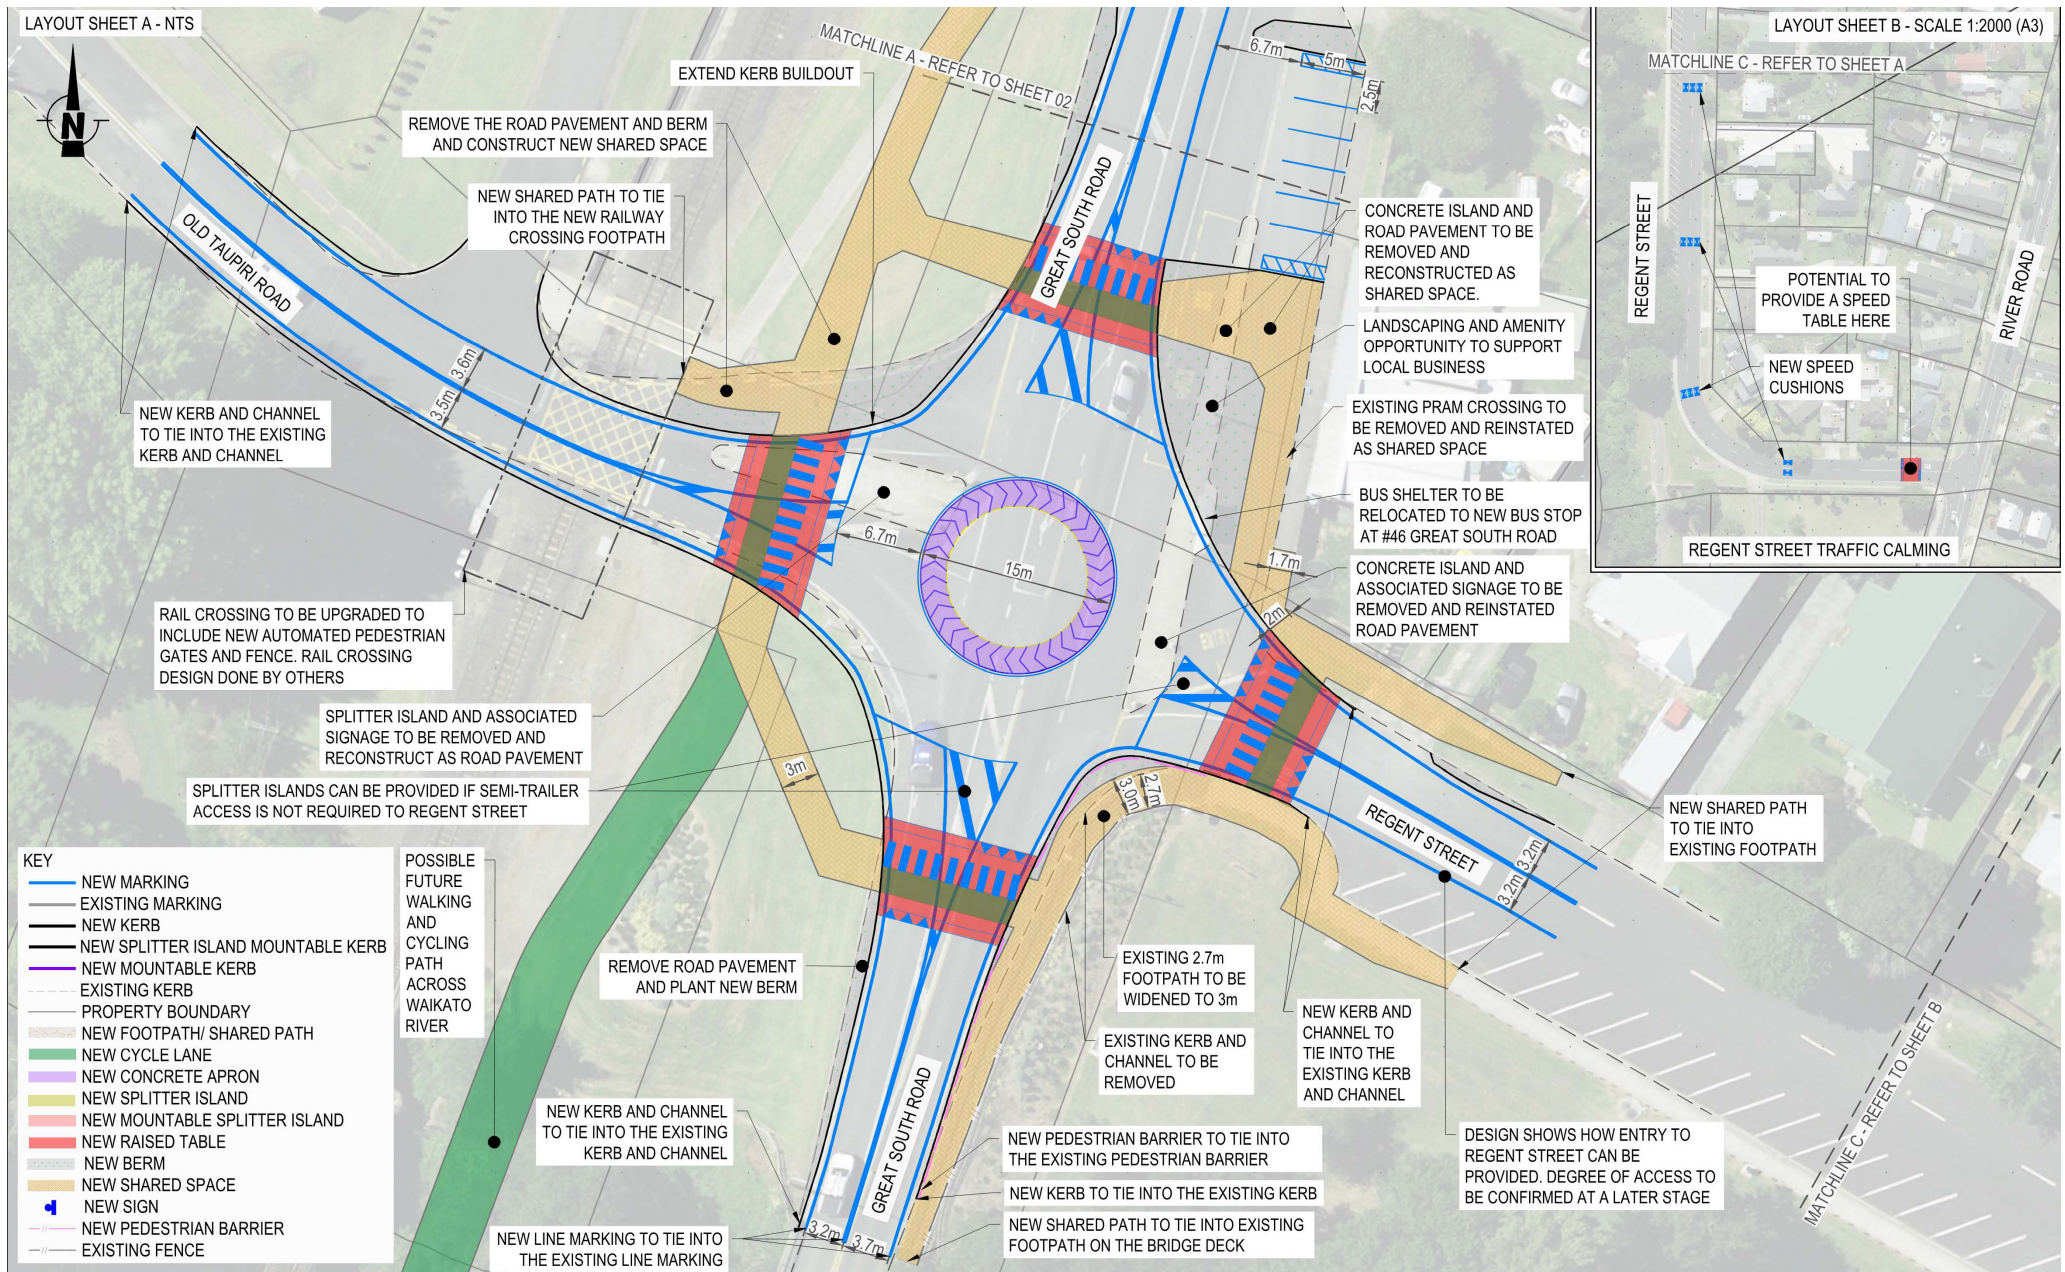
Great South Road / Old Taupiri Road Proposed Intersection Upgrades¹⁸
